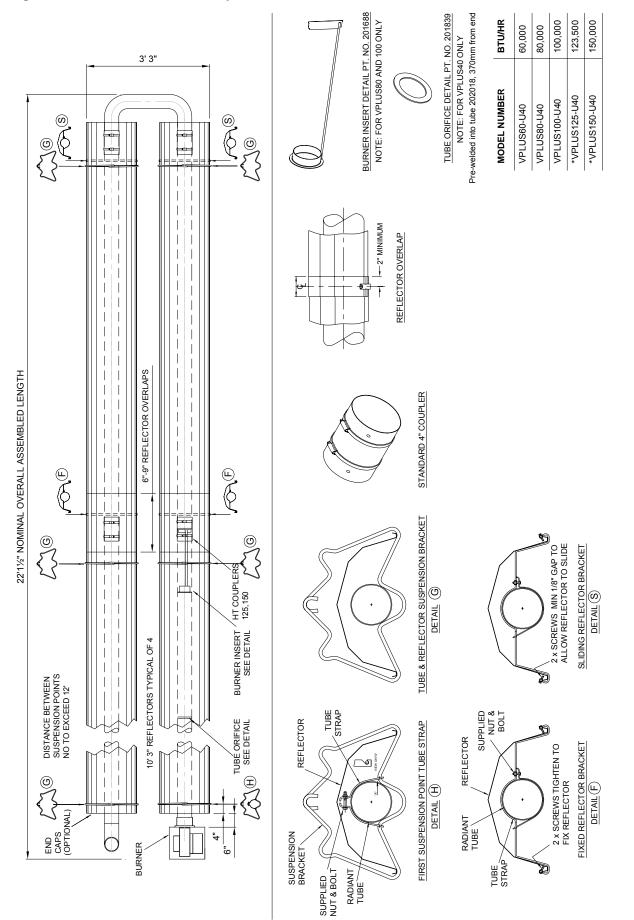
VPLUS Heater Assembly: Model U tube 60-U40, 80-U40, 100-U40, 125-U40 and 150-U40.
